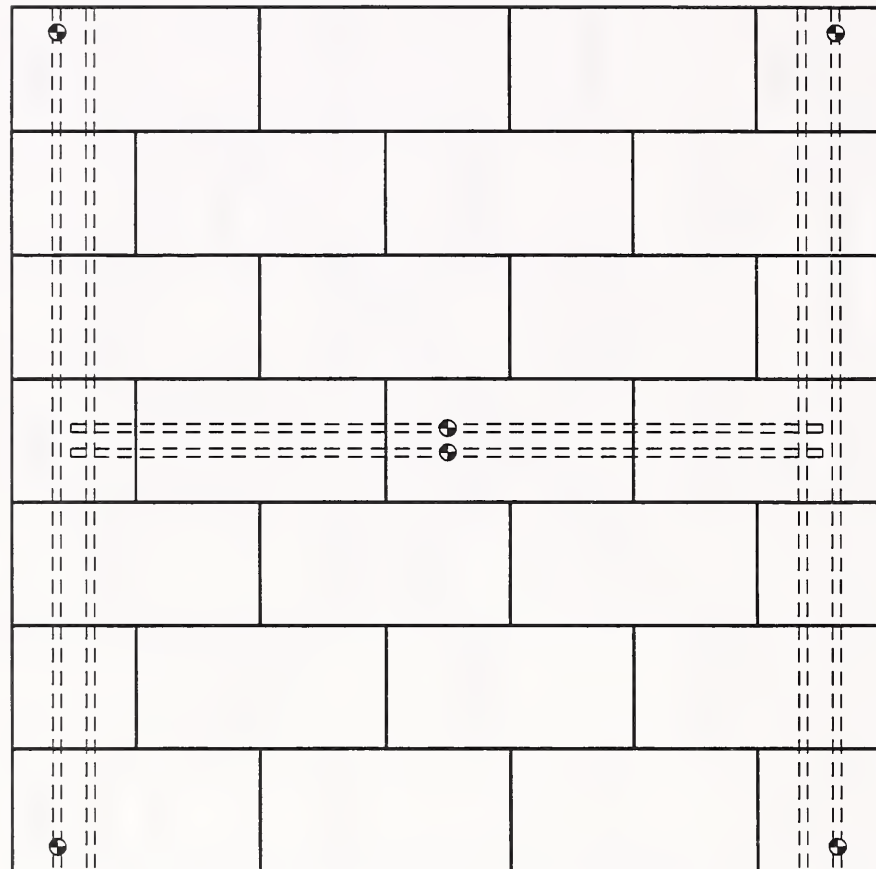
Strain Transducer Locations on South Face of Masonry Specimens
